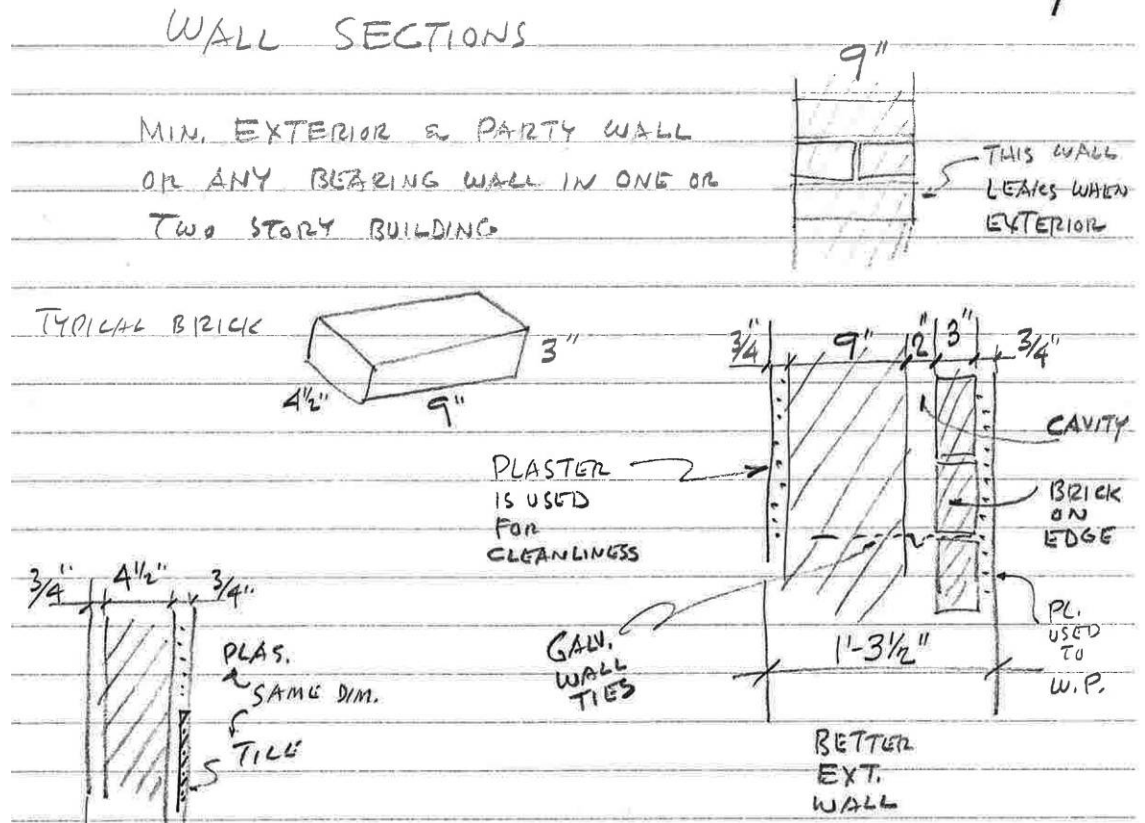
Notes from meeting held on December 12, 1963, discussing wall section.
